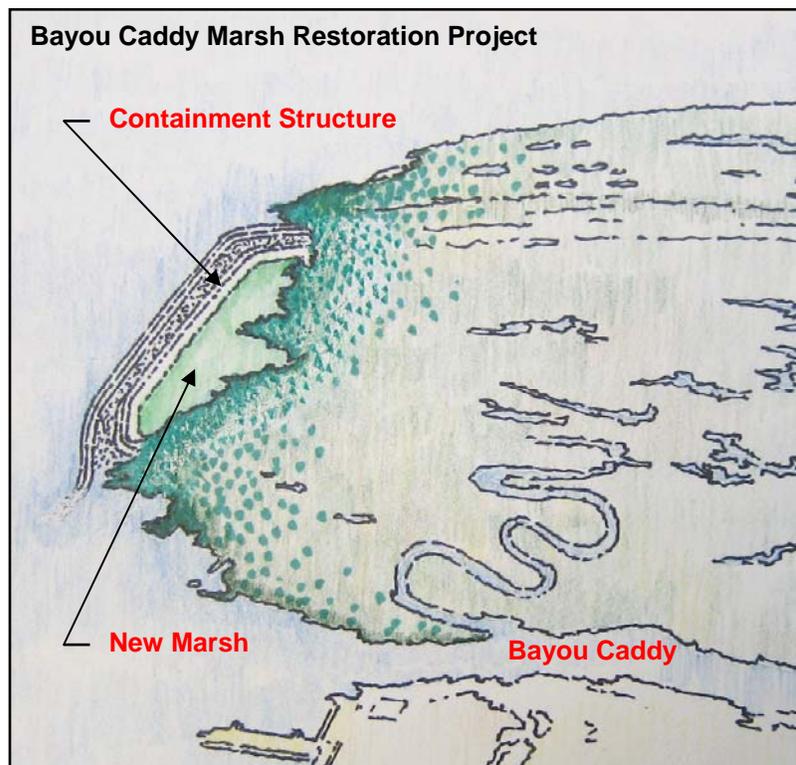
Rendering of proposed plan for Bayou Caddy by Ron Dawkins
